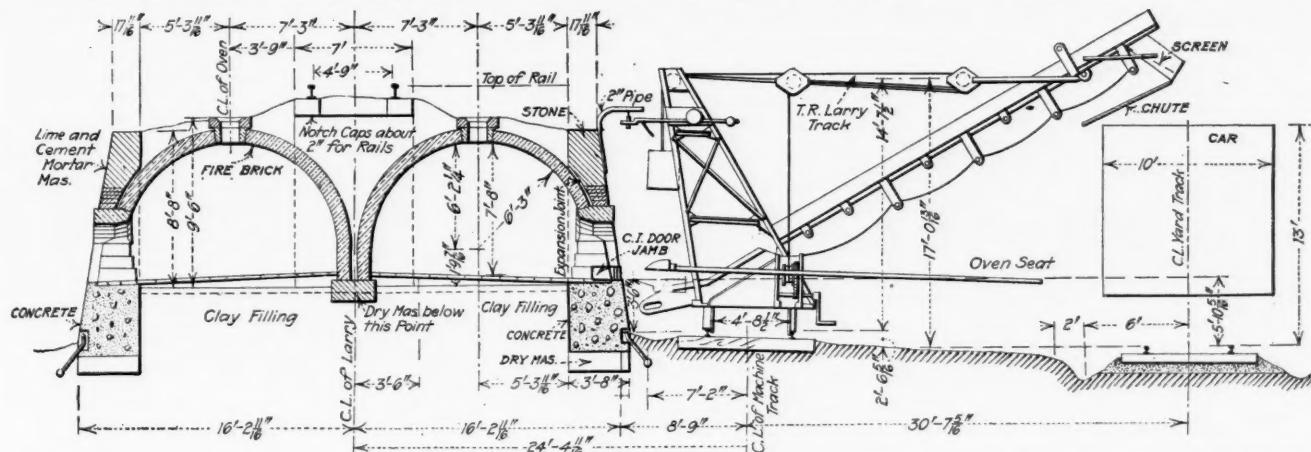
CROSS-SECTION OF BLOCK COKE OVEN ADAPTED TO MACHINE OPERATION—COKE-DRAWING AND LOADING MACHINE SHOWN IN POSITION
